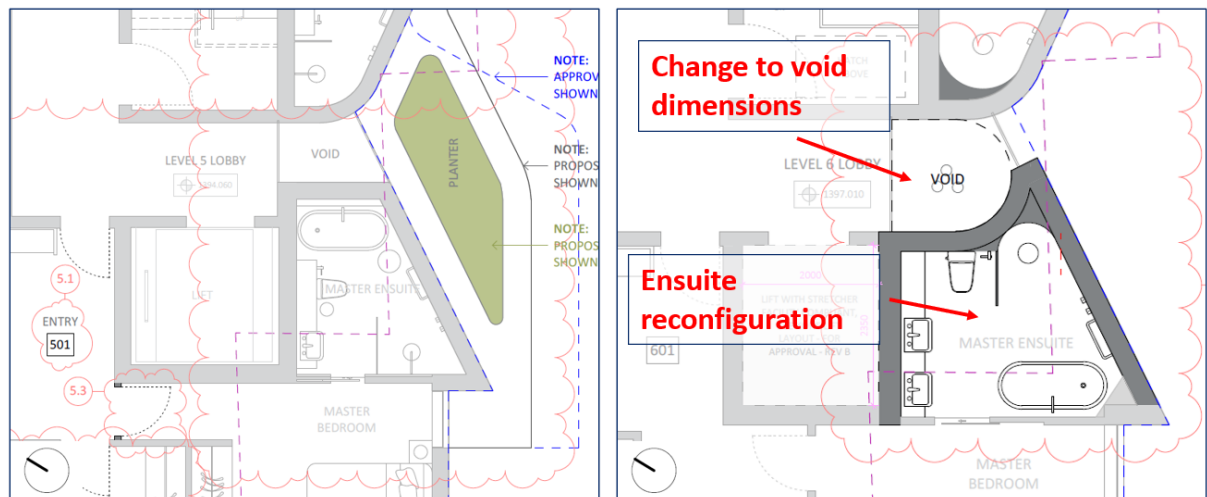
| Approved (left) and proposed (right) Level 5 master ensuite (Source: Department's Stamped Plans 2022 and Applicant's SEE 2023)
